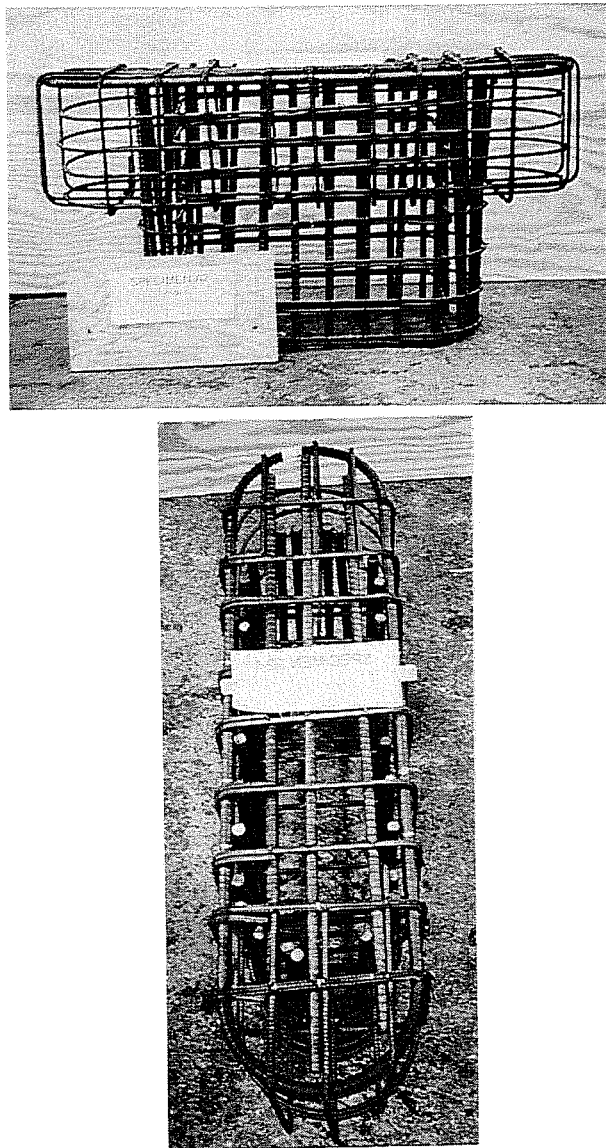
Steel Reinforcing Cage for Specimen A2
